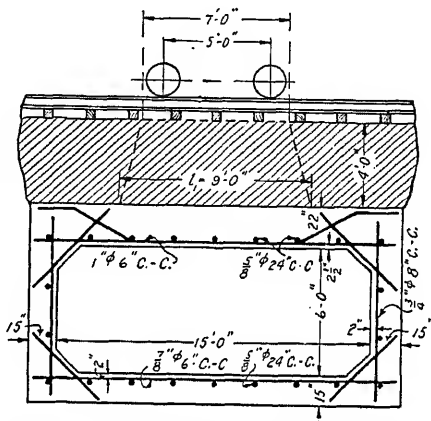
Design Diagram for Flat-Slab Culvert with 15-Foot Span
